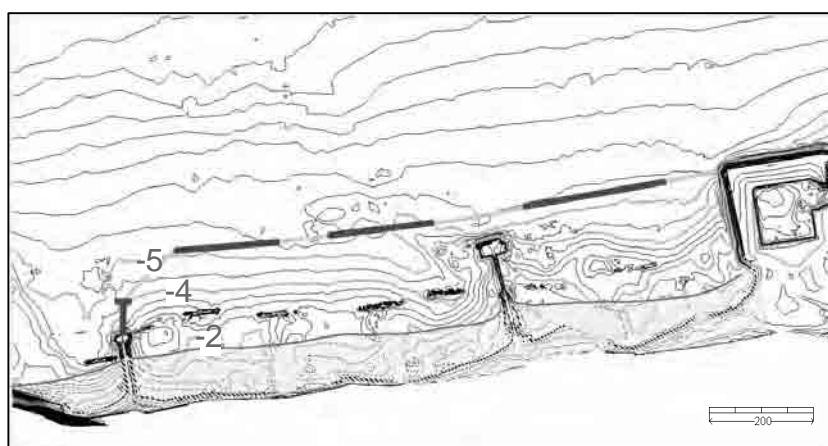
Revised facilities layout with sea sand at Eforie Nord
